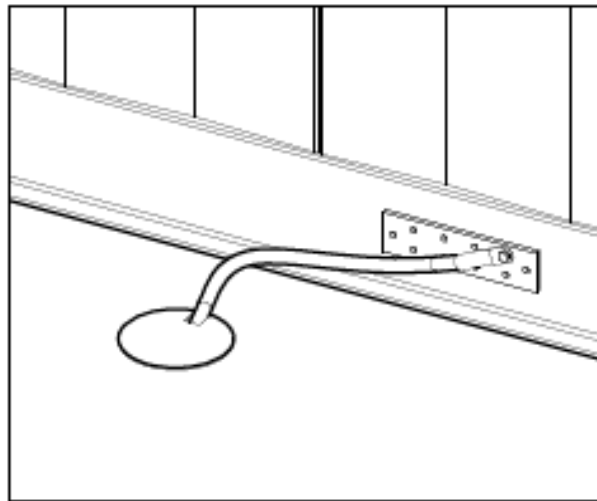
Connections for electrical grounding (May be located inside of grounding connection panel)
